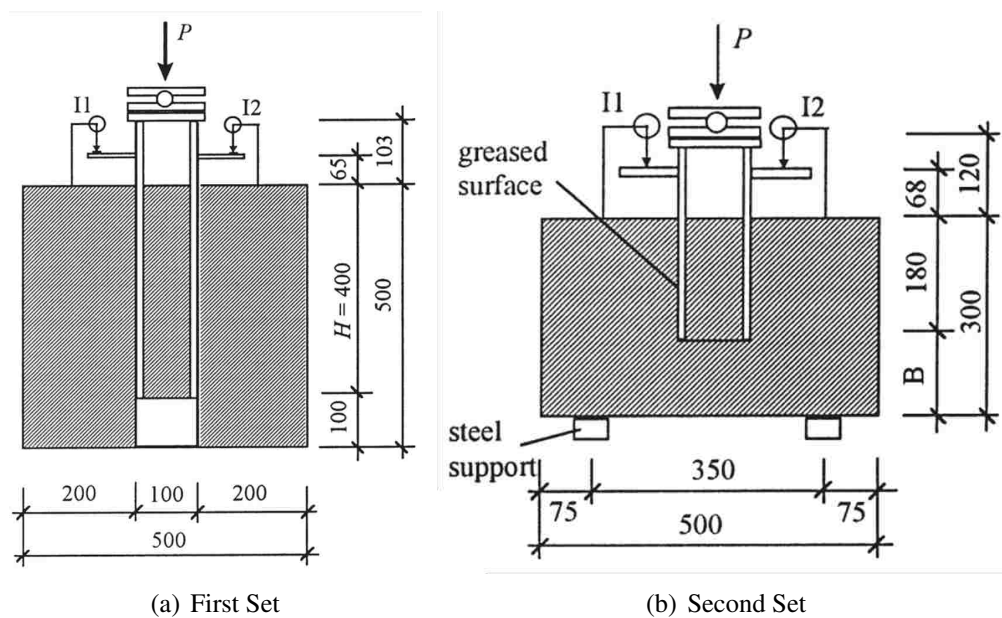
Test Specimen Drawings, Side View (Pertold, et al; units in mm)
